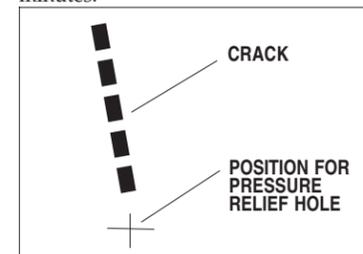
Longer active cracks which cannot be plugged with one plug should be repaired with multiple plugs working from the top down. Before starting divert active water from crack by drilling a pressure relief hole below crack. After the crack is plugged, the hole can be plugged.
